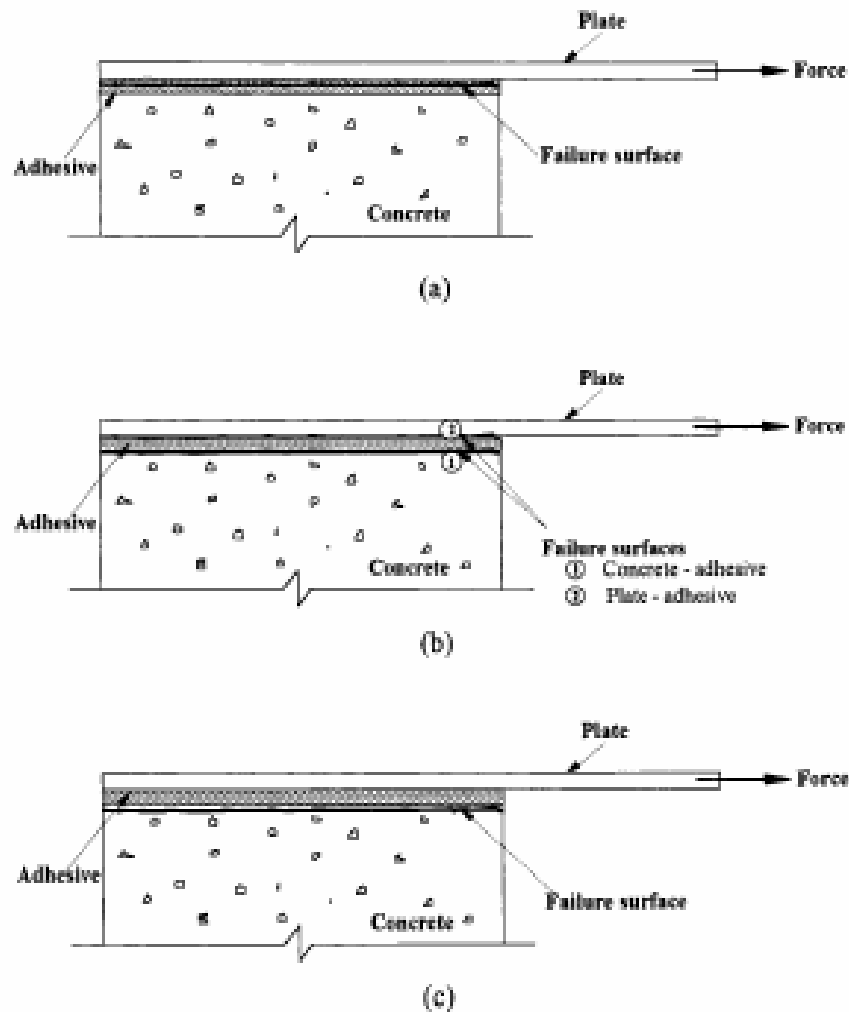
Different potential failure modes in a plate bonded joint (a) cohesive failure; (b) adhesive failure and (c) concrete shearing failure [21]
